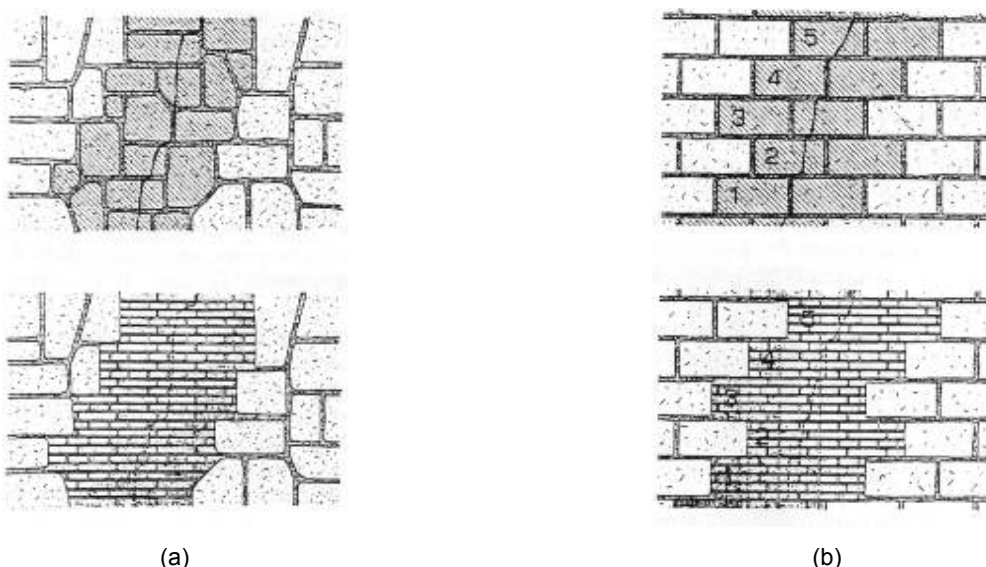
Masonry replacement intervention. (a) Regular stonework. (b) Regular squared block masonry.
